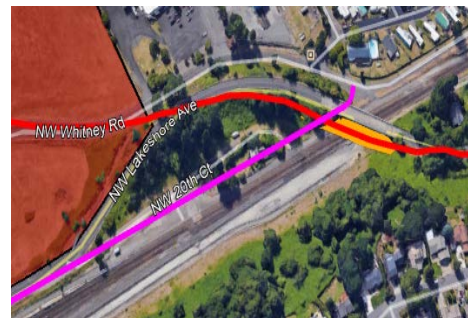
Alignment Alternative #2 at BNSF Railway Bridge
